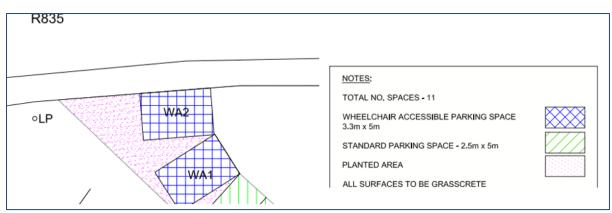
Dimensions of the Proposed Wheelchair Accessible Parking within Site B
